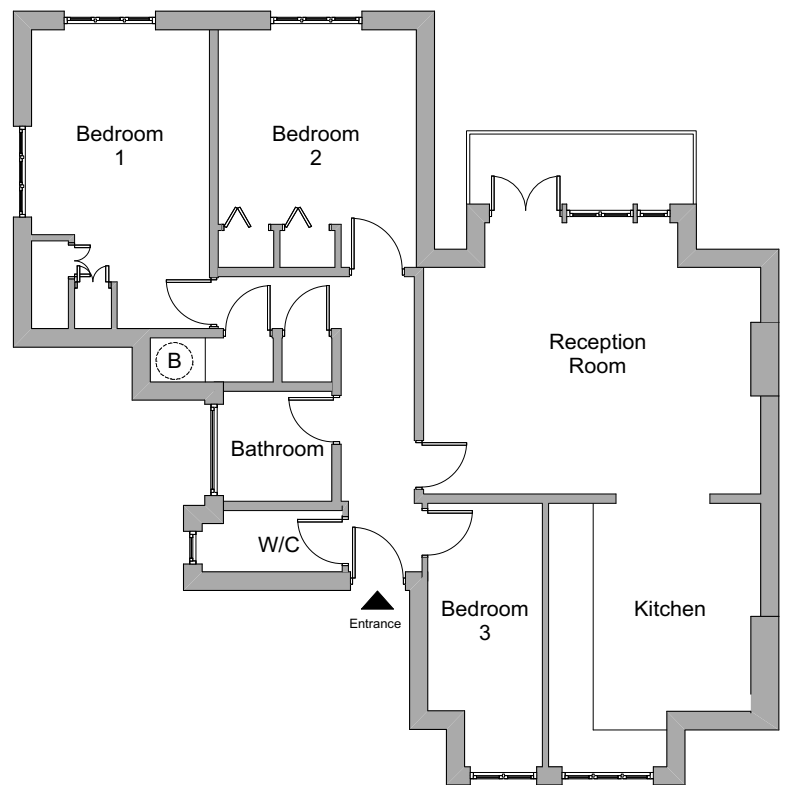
Above existing floor plans of Flat 6 No 47 Hollycroft Ave
